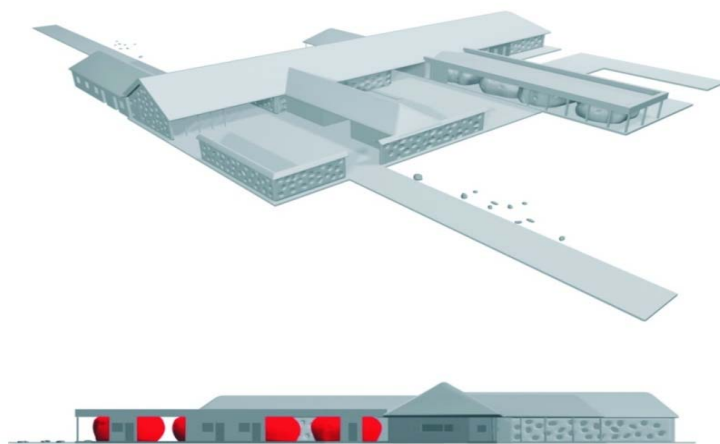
Friend House Hotel- General Layout of 3D (<http://www.archdaily.com/51767/friendhouse>)
